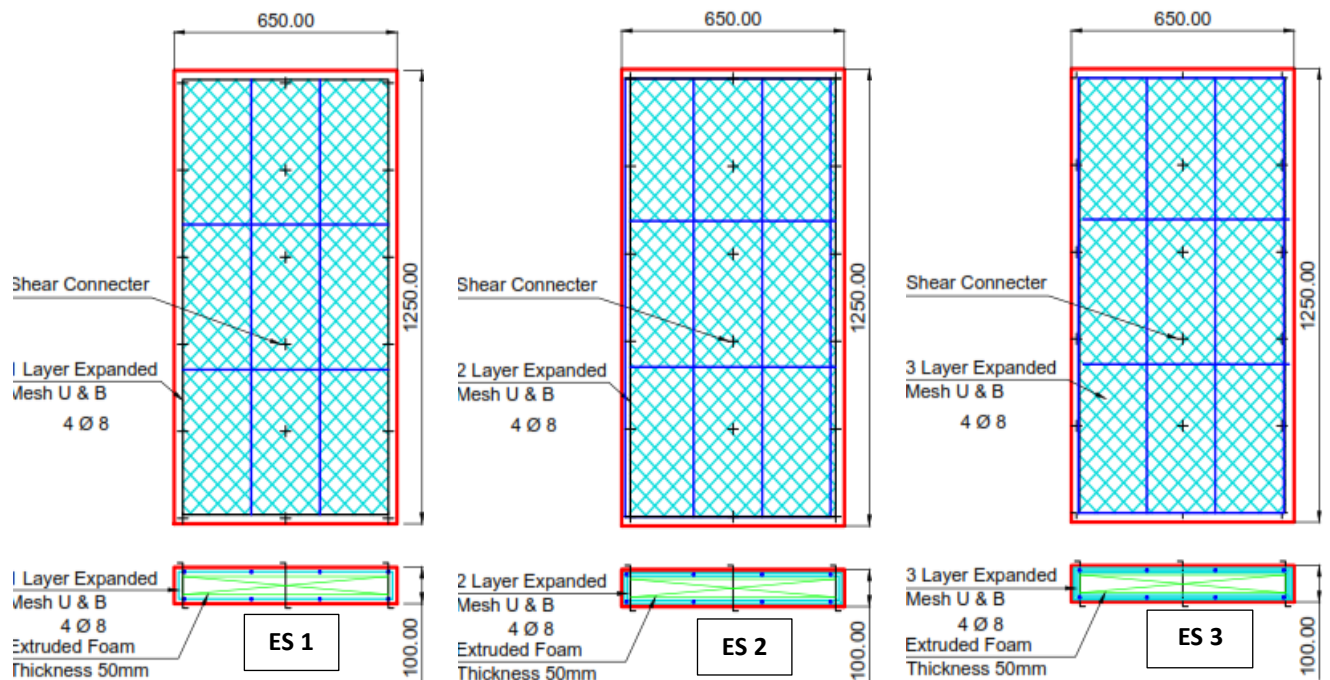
Reinforcement details of Group-4 walls (ES1, ES2 and ES3).
